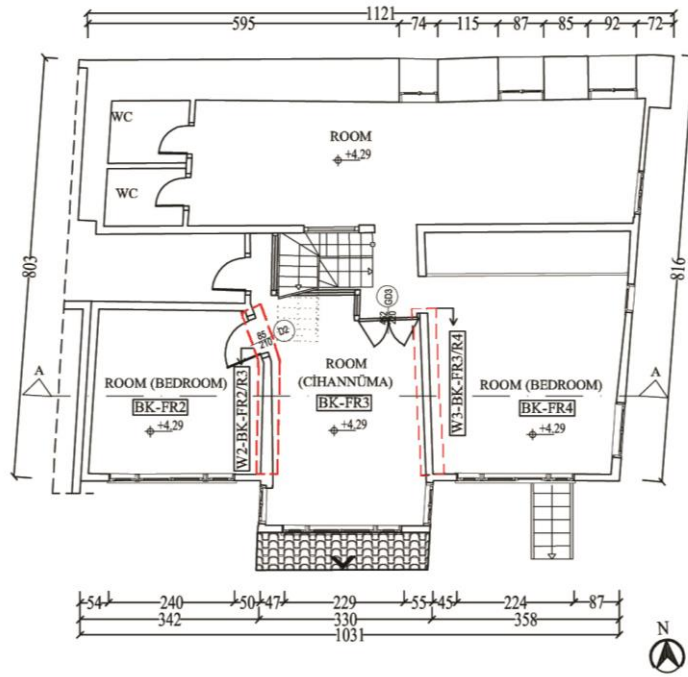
The first floor plan of Boyacızade Konağı in 1/100 scale (Redrawn by author).
